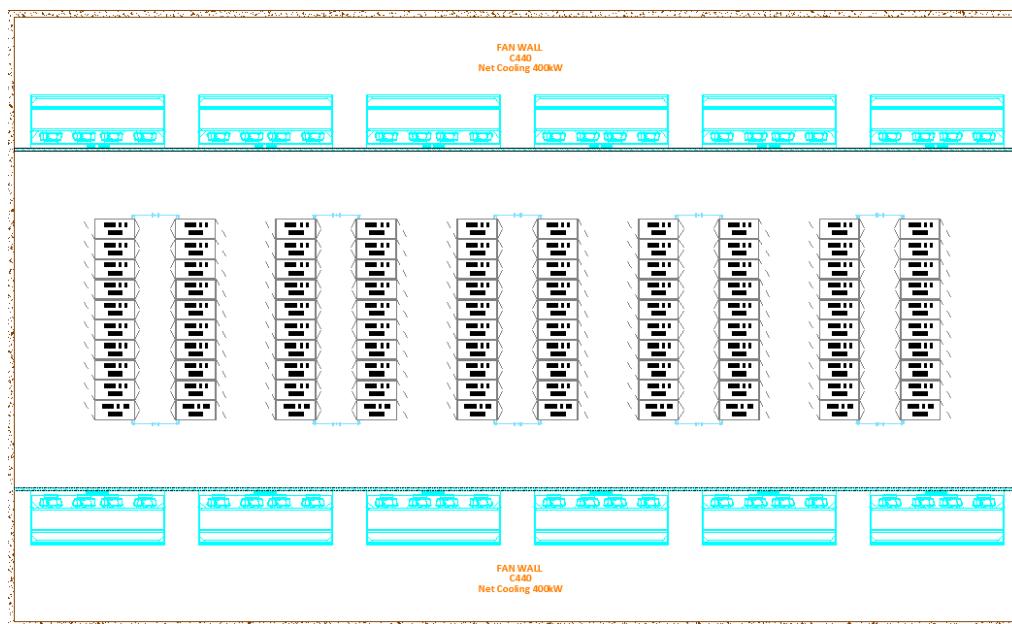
Fan Wall Solution Typical Layout (4MW, 40kw/R, 100Rack)
